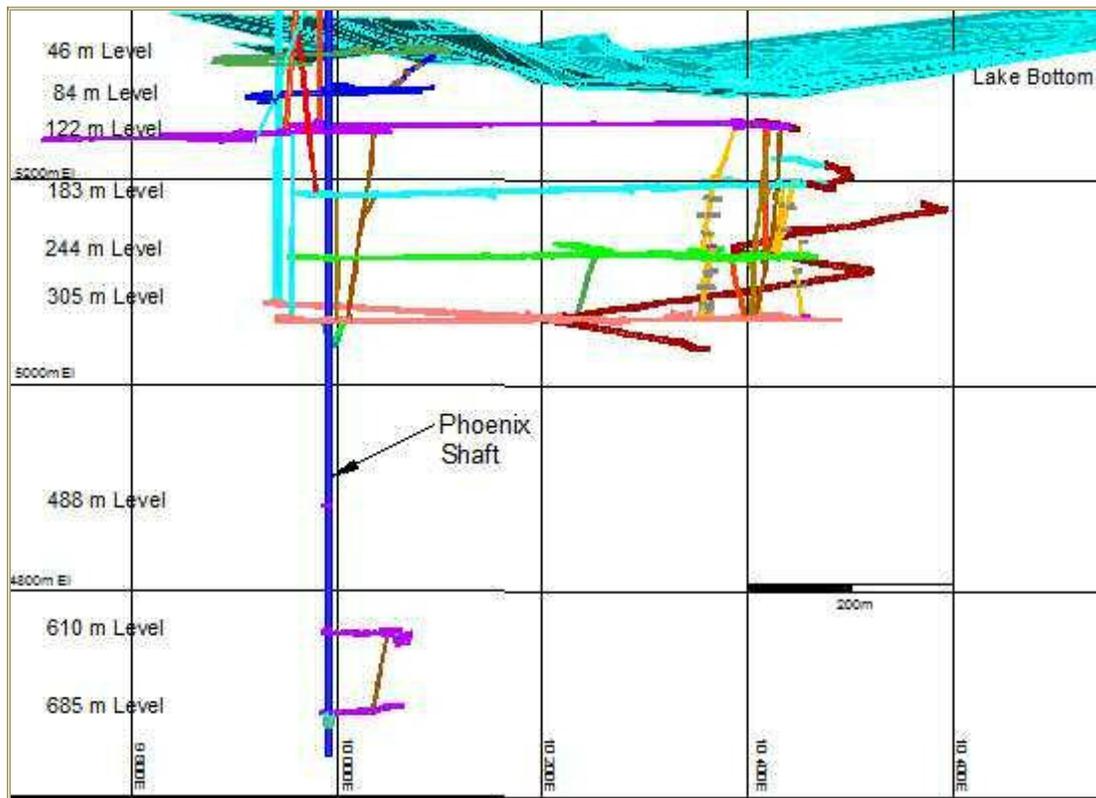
Phoenix Gold Project – Underground Workings (Looking Grid North) (Source: Rubicon, 2019)
